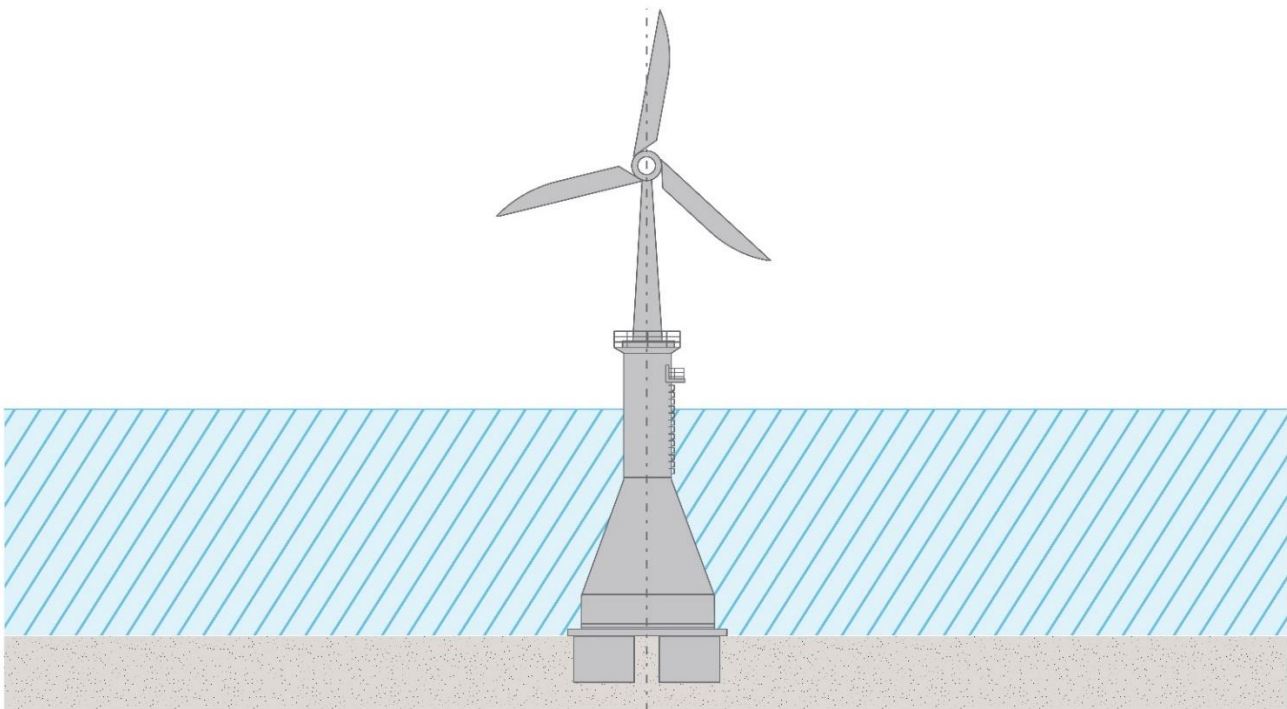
Schematic of a gravity base foundation with suction bucket ground strengthening for the 10 locations where ground reinforcement could be required.
